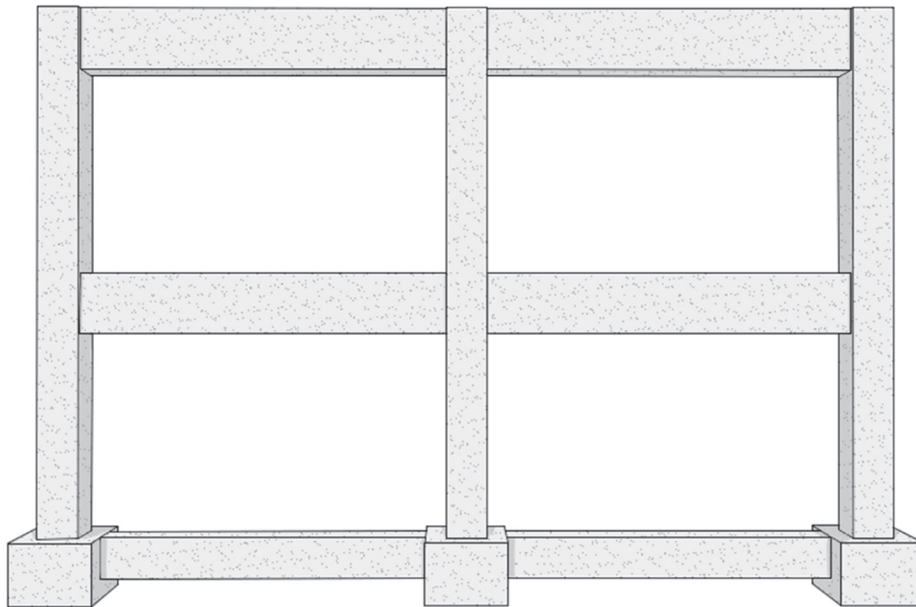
Overview of a typical reinforced concrete moment-resisting frame system and components.
